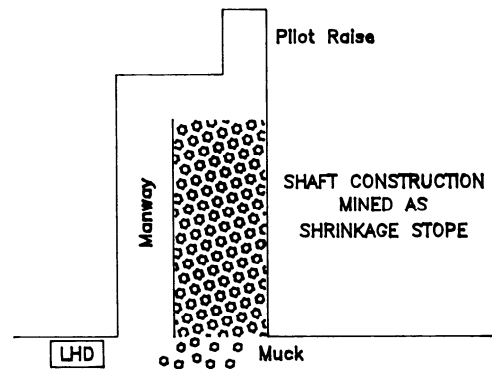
Construction shrinkage stopping by conventional method.
